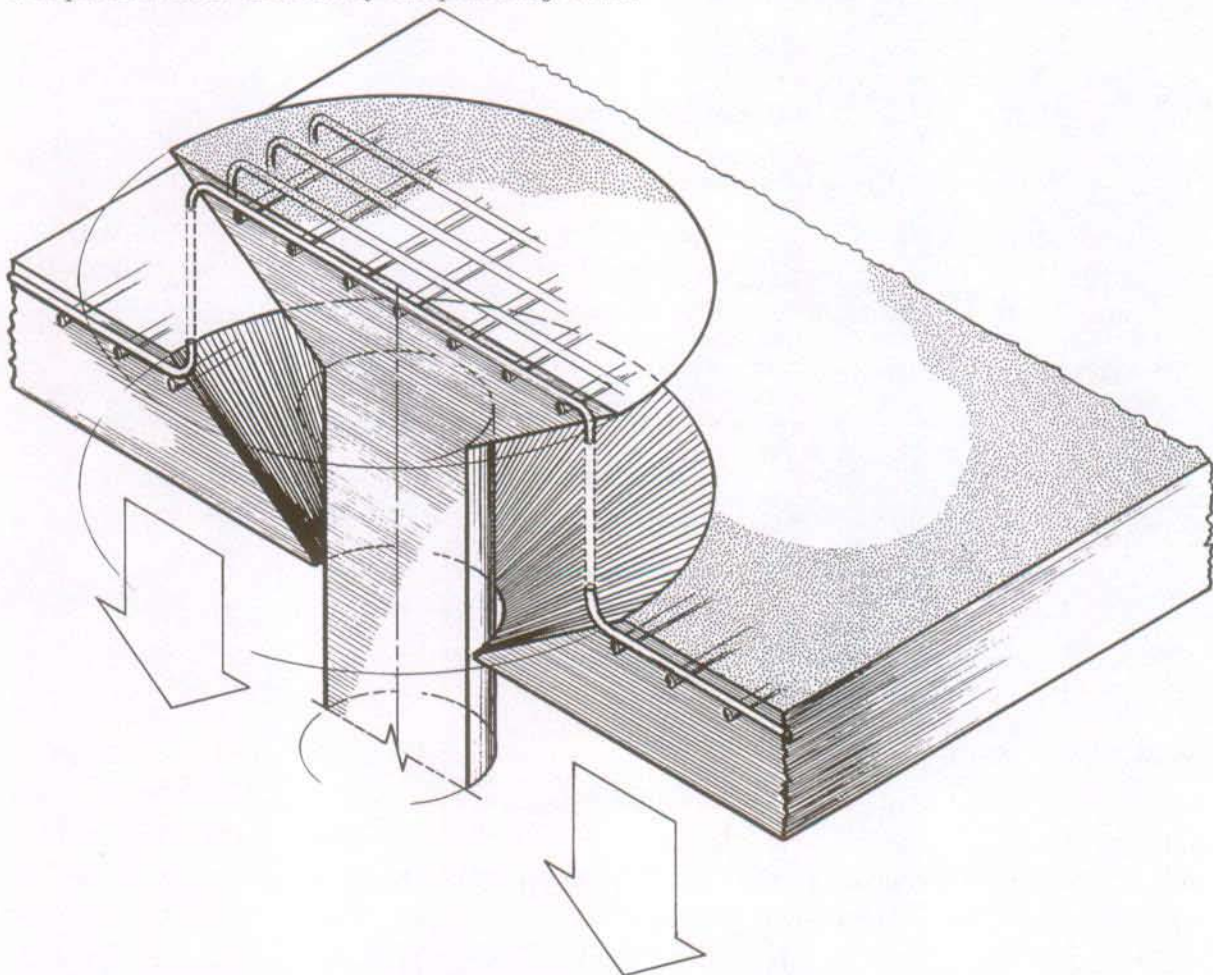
Sketch of punching failure in reinforced concrete
